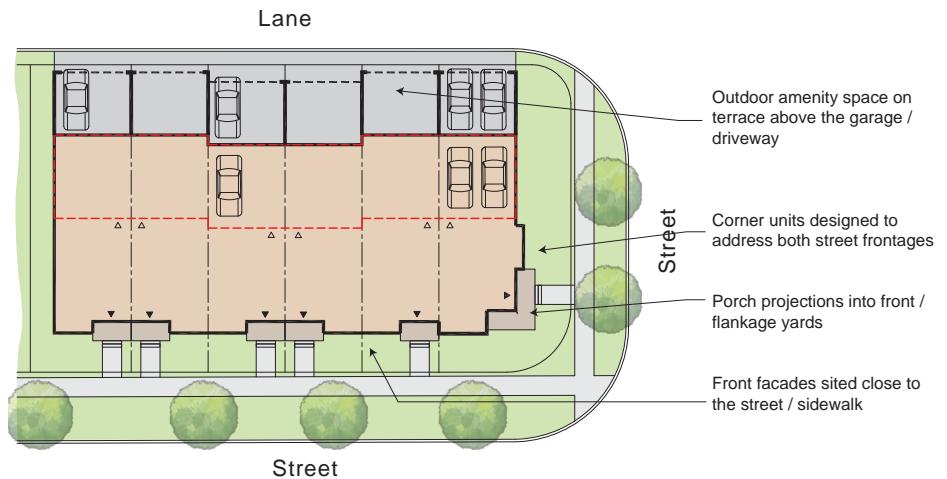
Conceptual plan layout for rear lane townhouses
